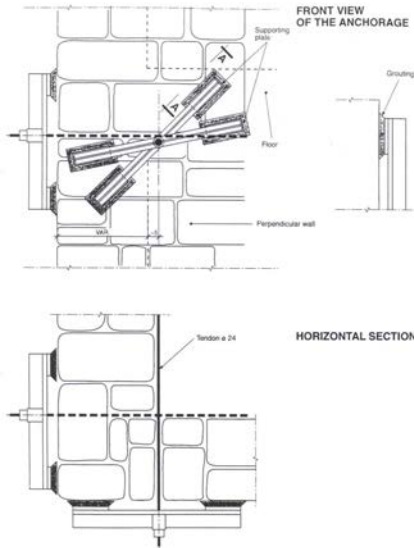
E: Seismic Strengthening - Wall-to-Floor Anchorage
